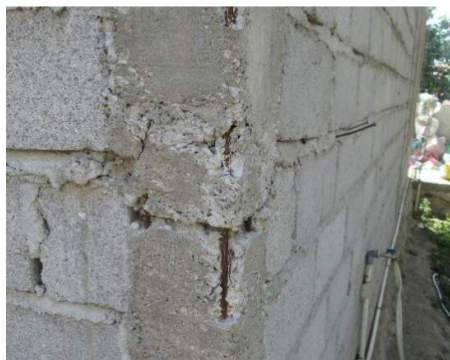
Insufficient concrete cover (exposed rebar), stirrup was provided every 20 - 40cm
